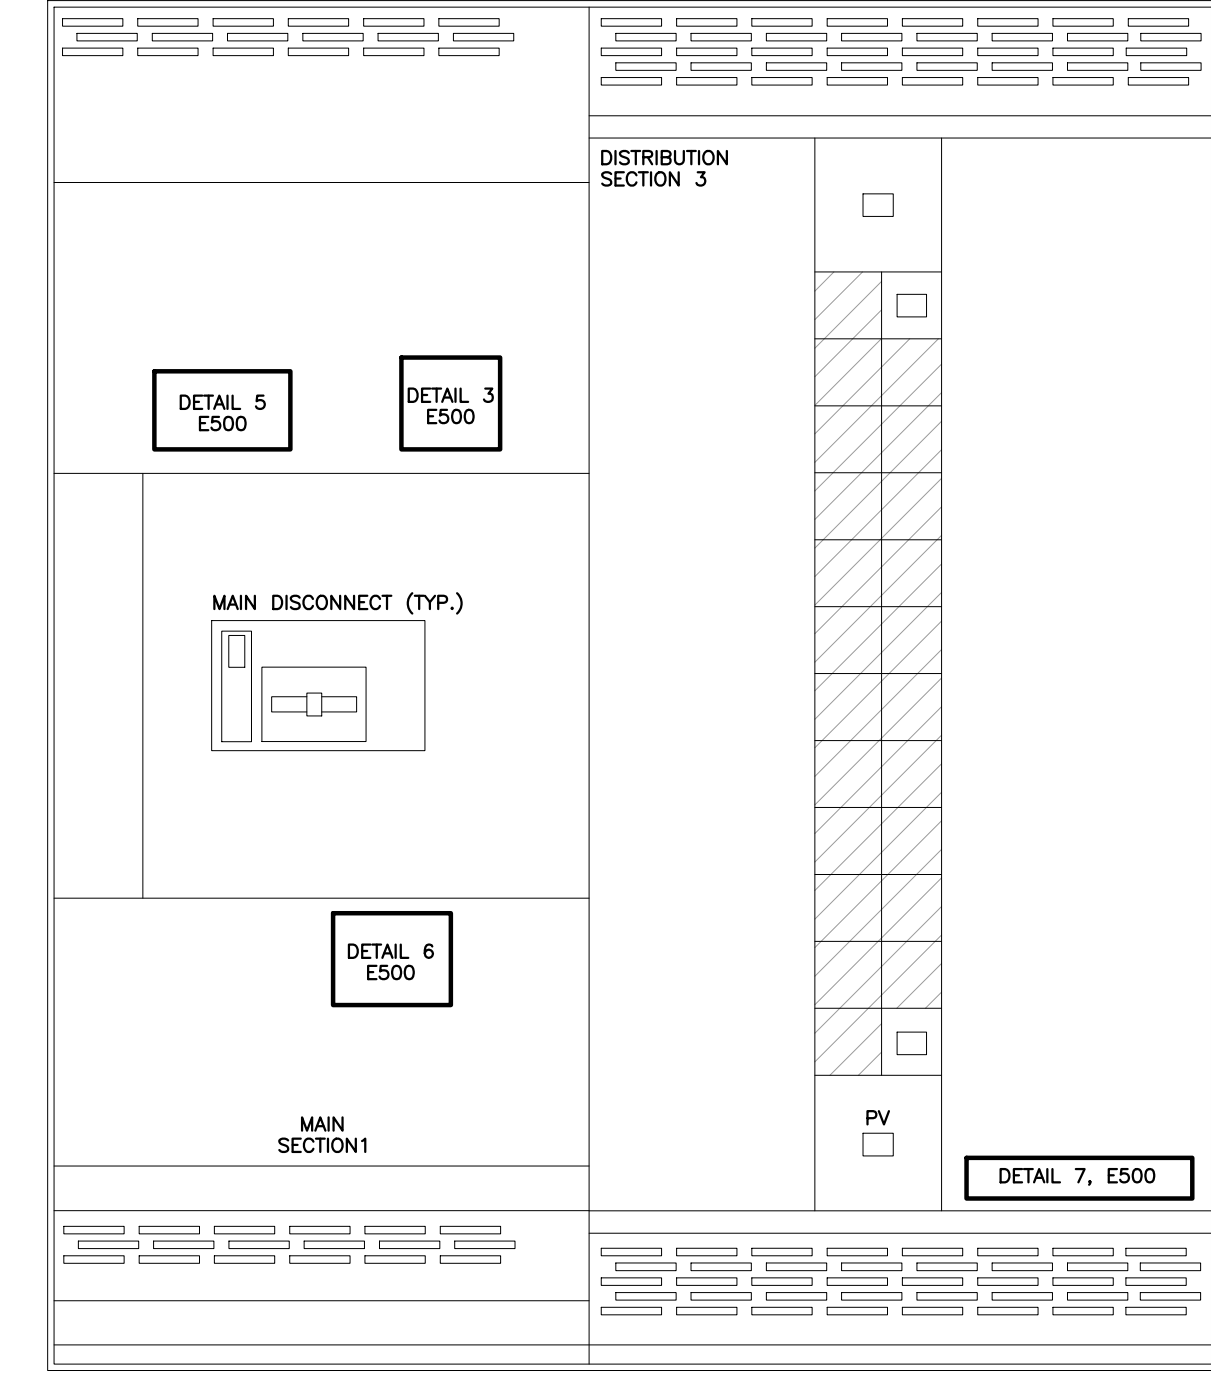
EXISTING BUILDING SWITCHGEAR (TYP.)
